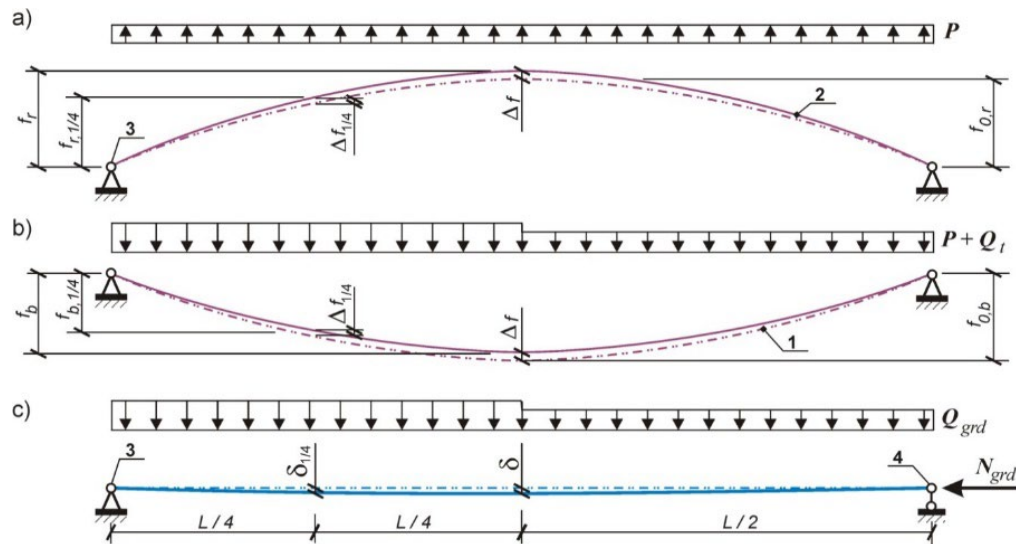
Structural model of the section of the roof: a, b – restraining and bearer chords, respectively, c – the stiffening girder; 1, 2 – initial and deformed positions of the elements, respectively; 3 – fixed support; 4 – support fixed in vertical direction only; P is the link load between the chords; Q_t and Q_{grd} are the external transverse loads on the cable truss and the girder; N_{grd} is the longitudinal load on the girder.
